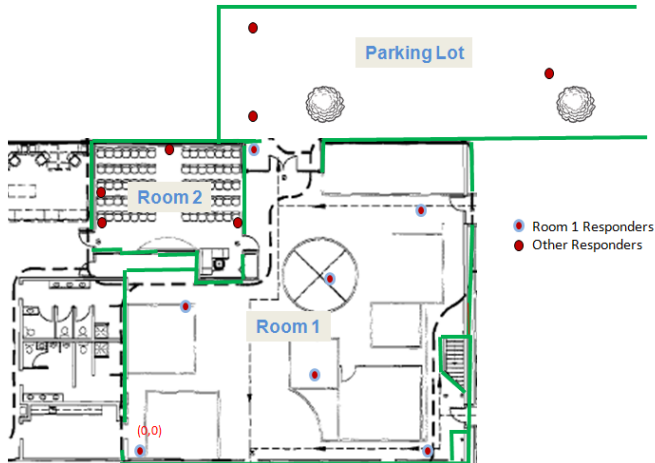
Floor Plan Illustrating Indoor and Outdoor Areas along with UWB Responders Survey
